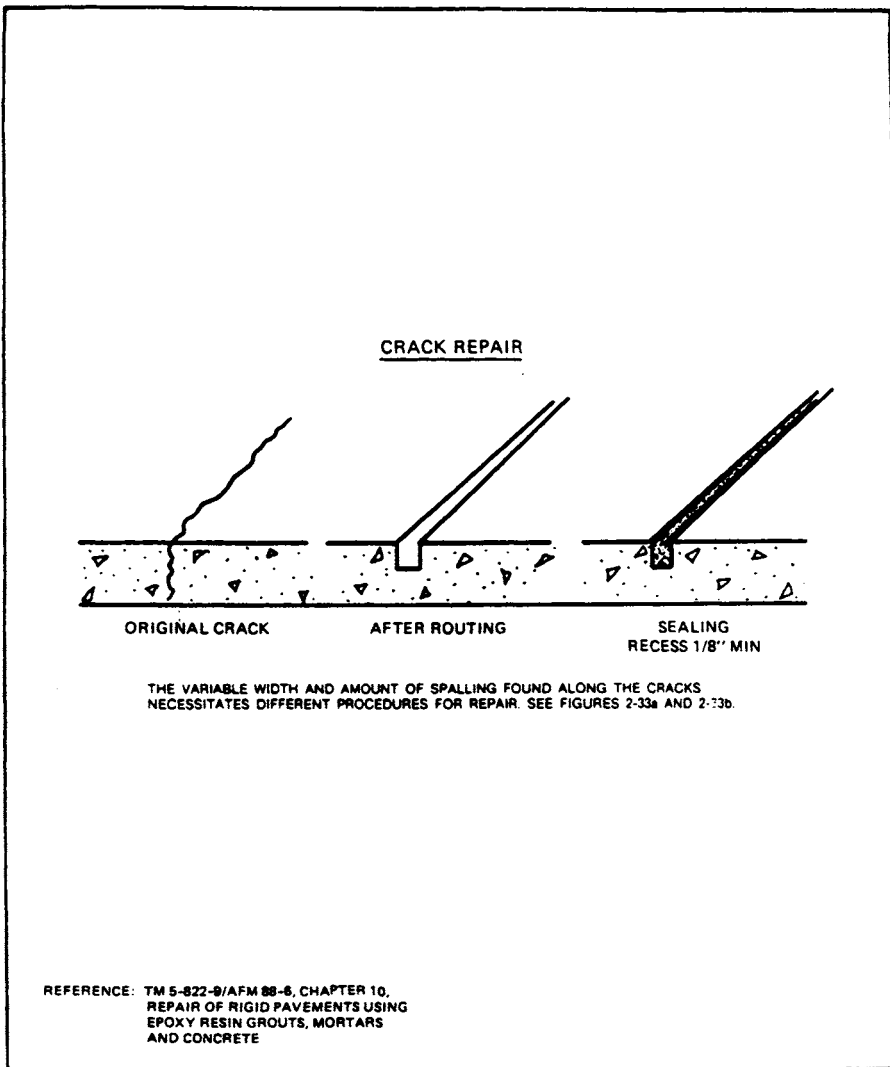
Crack Sealing of PCC Pavement (From U.S. Army and Air Force 1988).
